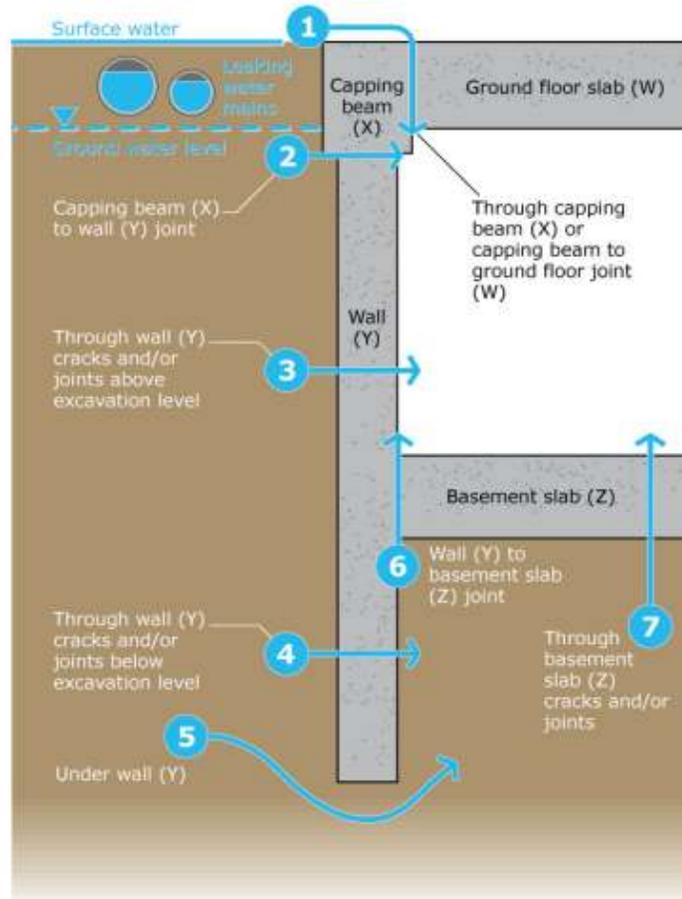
Some potential water sources and paths through an Embedded Retaining Wall
